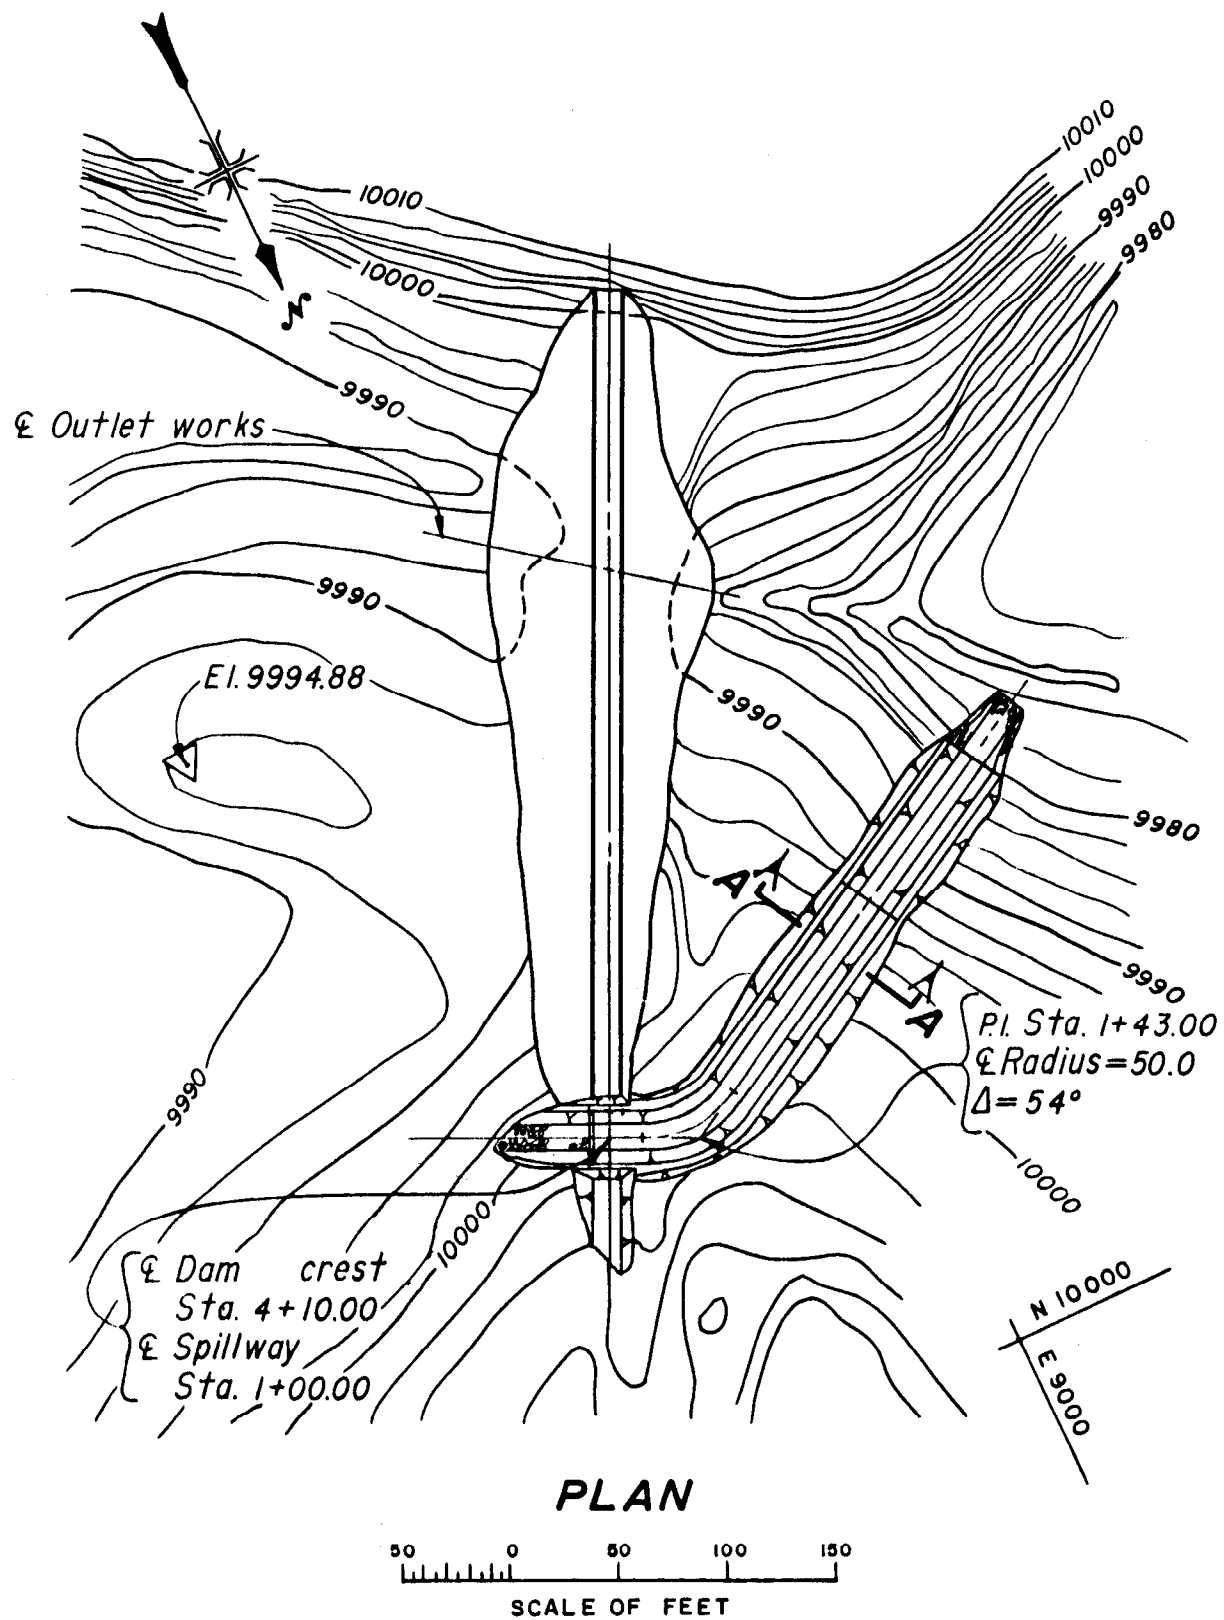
Overall plan view of Cottonwood 5 Dam and emergency spillway.
